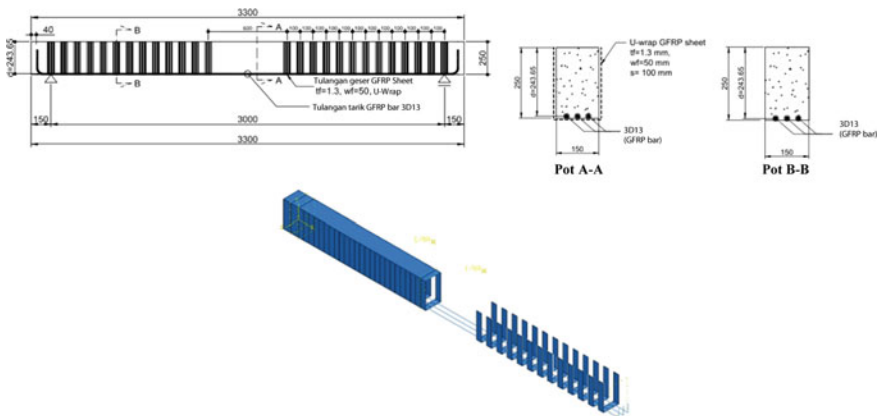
Modeling scheme of fiber beam without cover concrete (BFTS)
